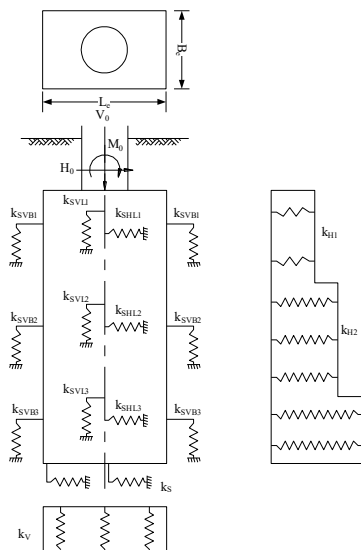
Winkler spring model for soil reactions on caisson [adapted from Japanese Specifications of Highway Bridges (JRA 2012)]
